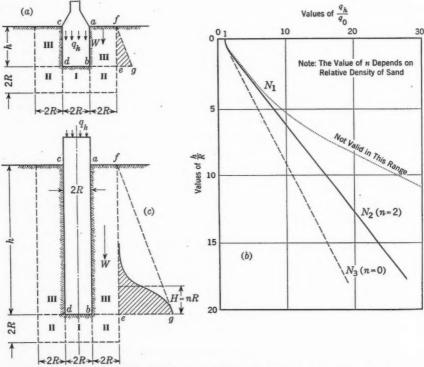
Relation Between Bearing Capacity and Depth of Foundation for Circular Footings (a) and Cylindrical Piers (c).
